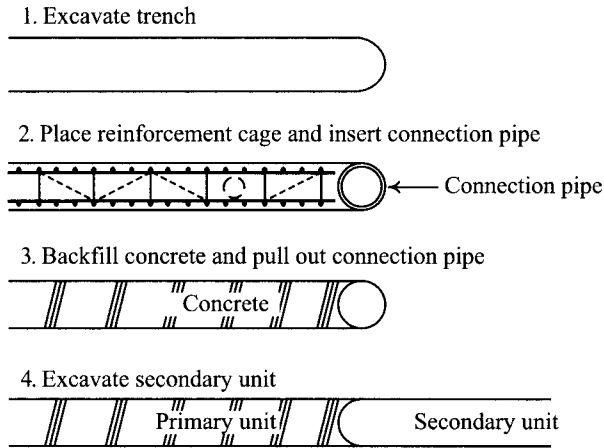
Joint of diaphragm walls: the connection pipe method.
